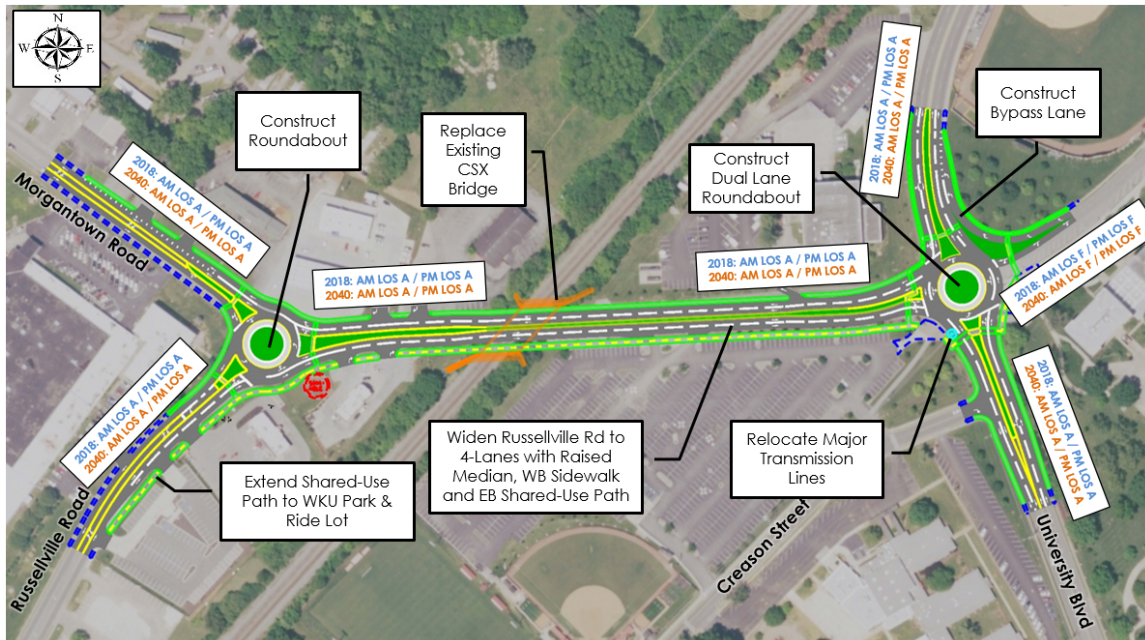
Widen Russellville Road with Roundabouts at Morgantown Road and University Boulevard
